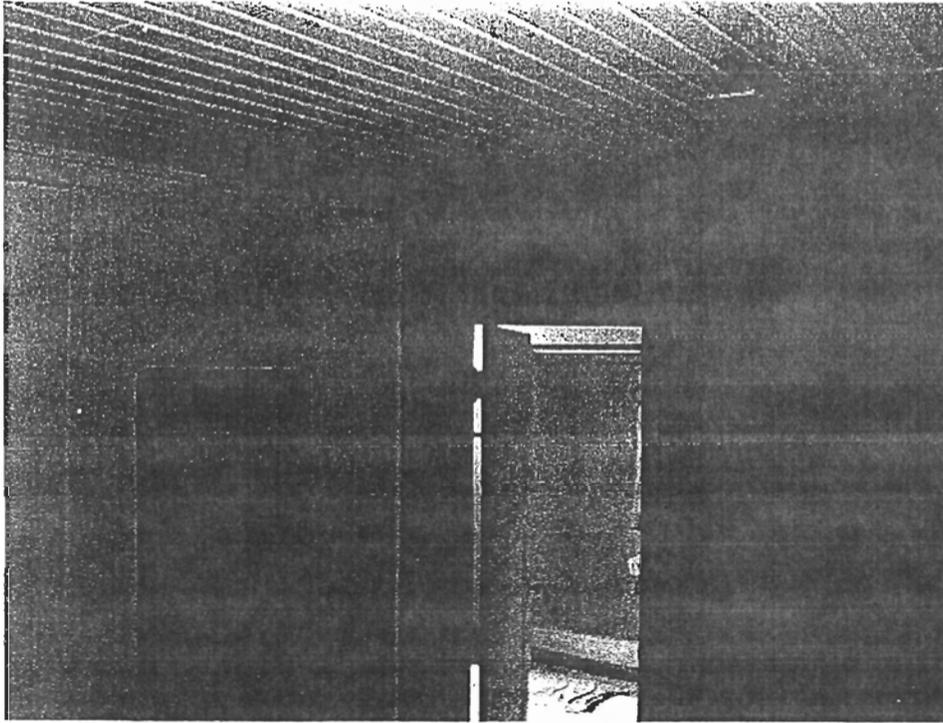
Out-of-square door header under a floor girder at the ground floor of the main house.
